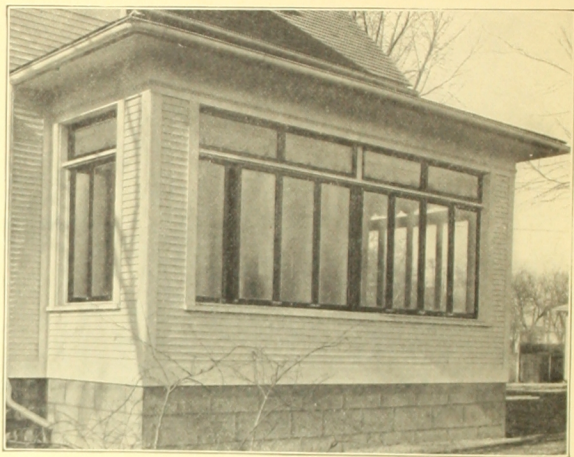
Outside view of sun parlor shown on Figure 5. Windows closed except one sash of the side window and slight opening at the left end of the front window.
